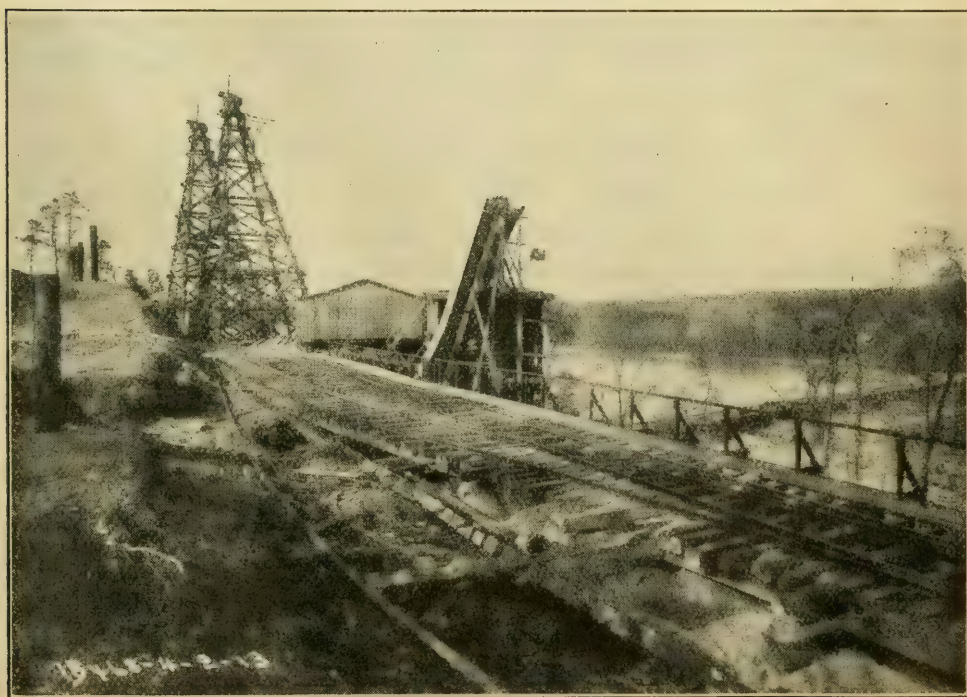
END OF HIGH-LEVEL LINE, SHOWING CABLEWAYS, CEMENT WAREHOUSE, AND MIXER BIN.
